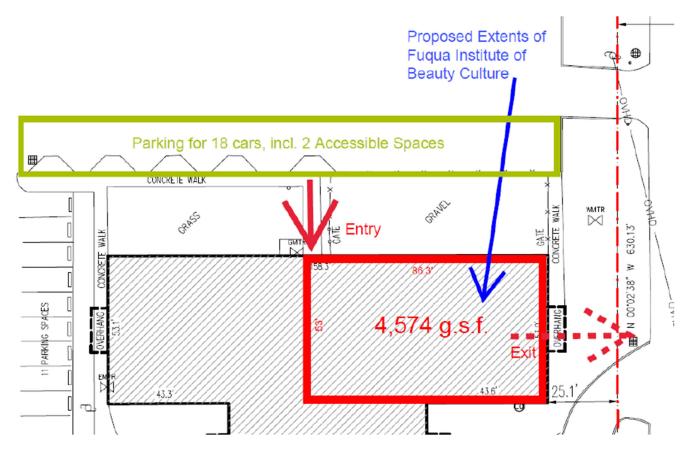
Zoomed in site plan for vocational school inside 5640 E 38th Street.
